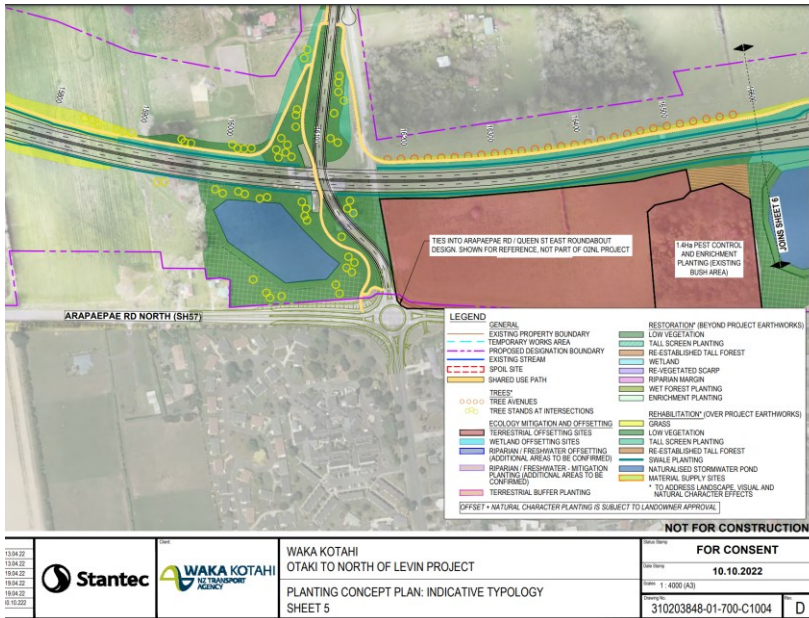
Planting concept plan for Queen Street East Overpass (source: NOR Vol III - Planting Plans)
